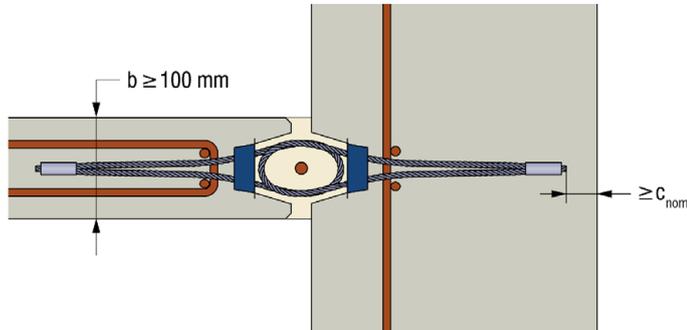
Wall – Wall – T-Connection - standard detail (*recessed installation*)
